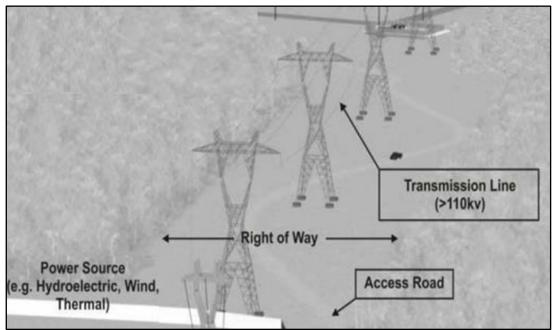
Right of Way and Access Road for OHTL (IFC, 2007)
